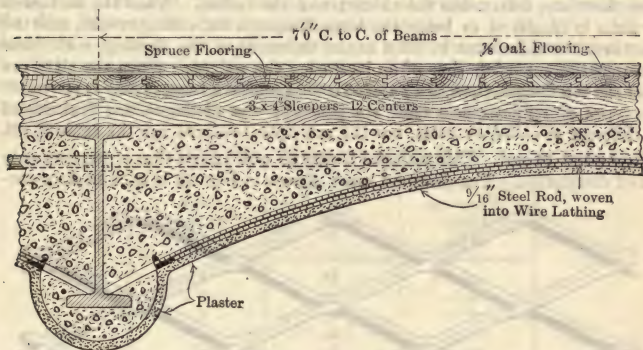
Roebling Segmental Concrete Floor-arch. Type 2
